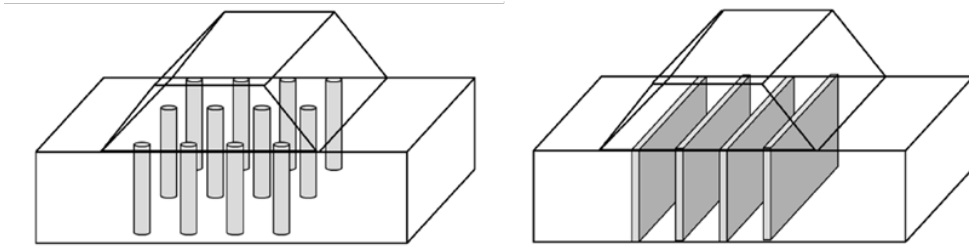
Conversion of the discrete cylindrical stone columns (left) to equivalent strips(right) (Castro, 2017).
